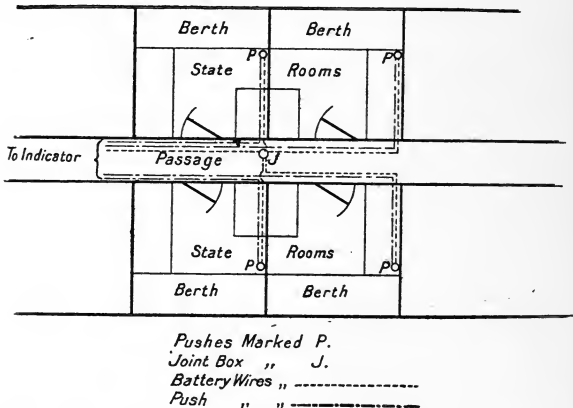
BELL WIRING SCHEME, USING JOINT BOX.
